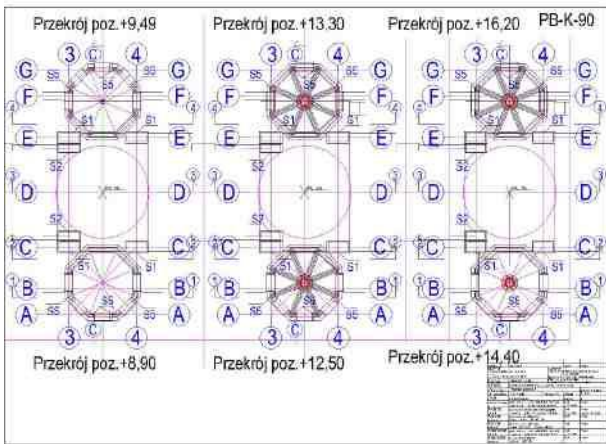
Horizontal cross-sections of octagonal side chapel covered by masonry dome with reinforced-concrete ribs. Levels +8.9 to +16.2. PB-K-90b. A2.
